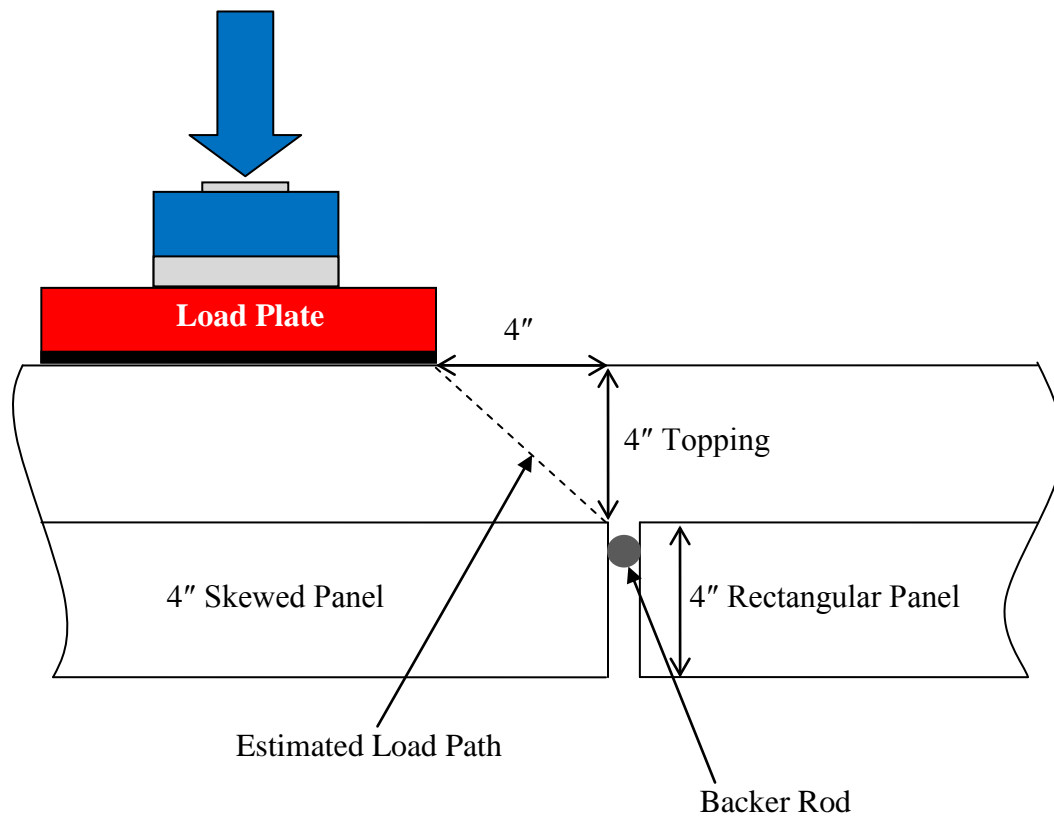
Load Plate Position over Square End of Precast Panel
